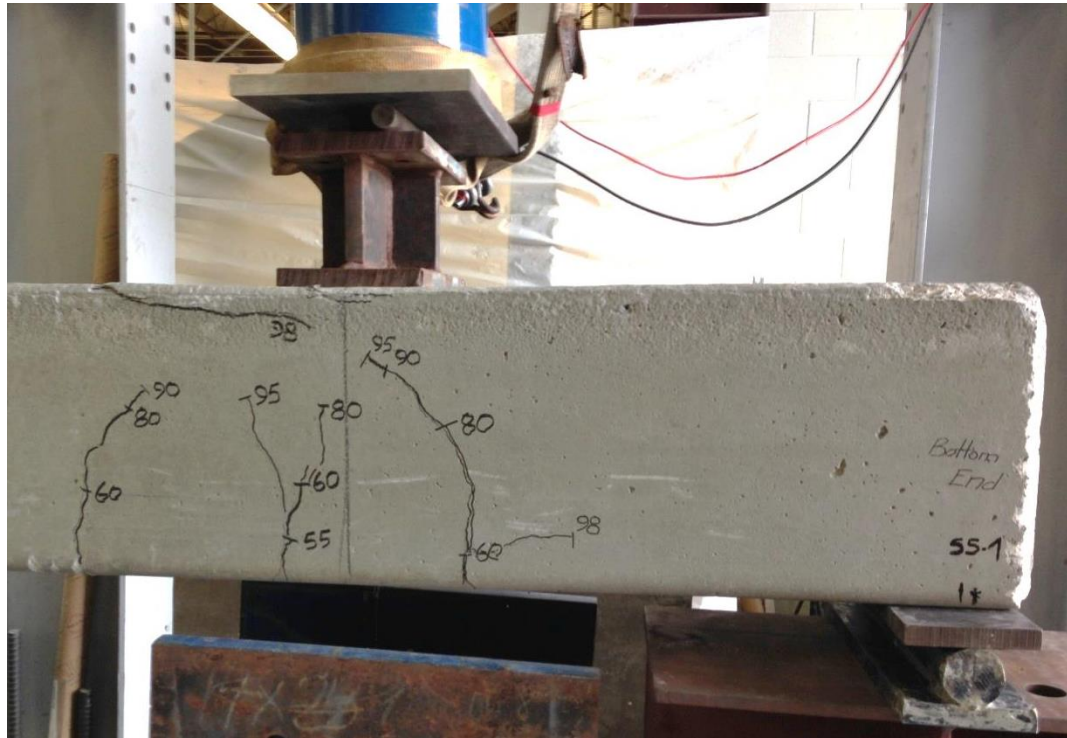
Typical crack pattern at failure. Numbers on the pile indicate the applied load when cracks appeared. (1 kip = 4.45 kN)
